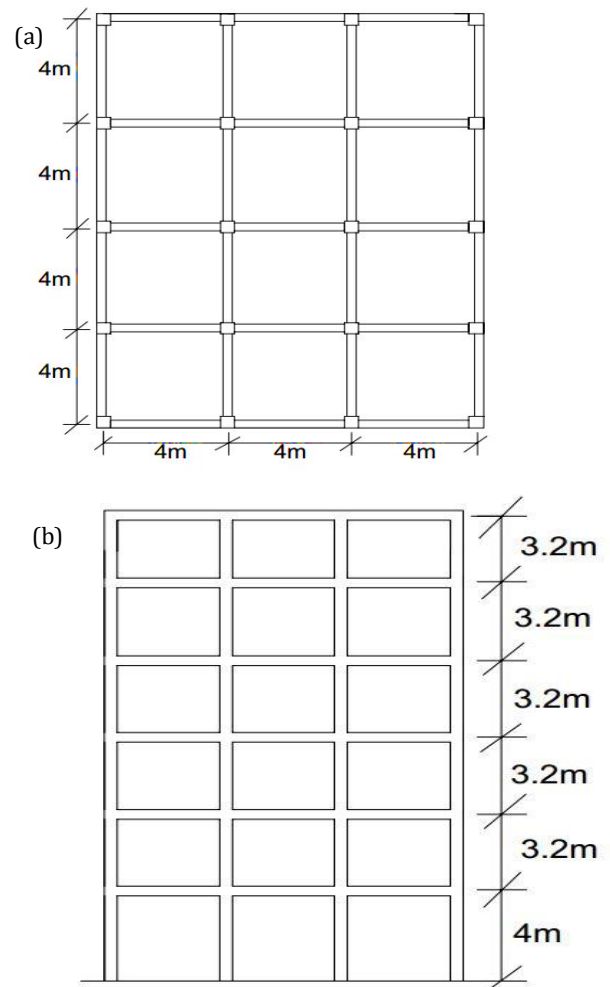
General view of the building under analyses: (a) Building plan; (b) Building elevation.
